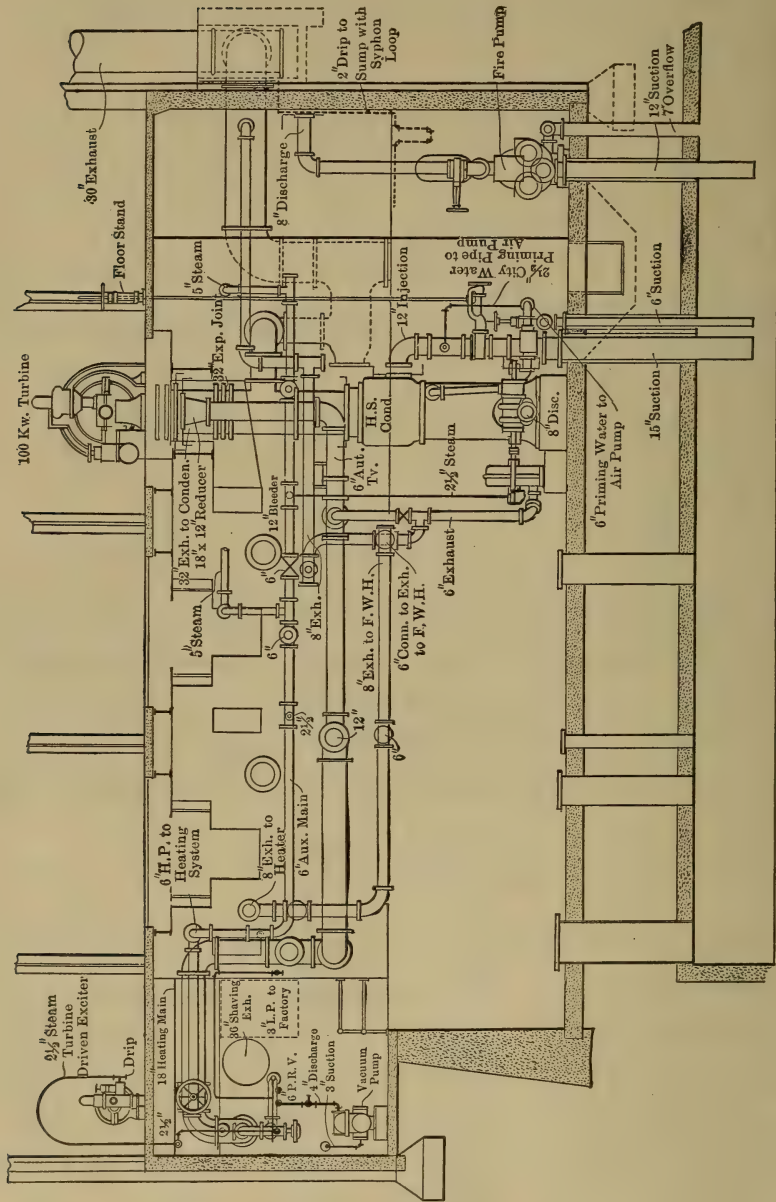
Longitudinal Section of Engine Room Basement, showing Condenser Connections and Piping to Heating System.
